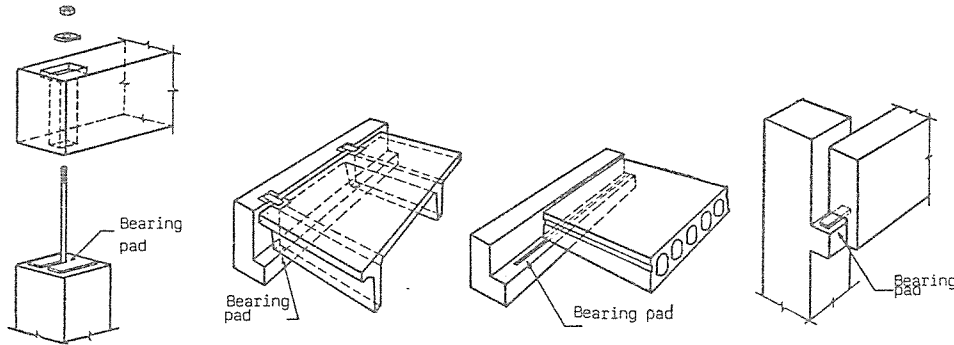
Beam. Fig.2. Double Tee. Fig.3. Slab. Fig.4. Wall.
